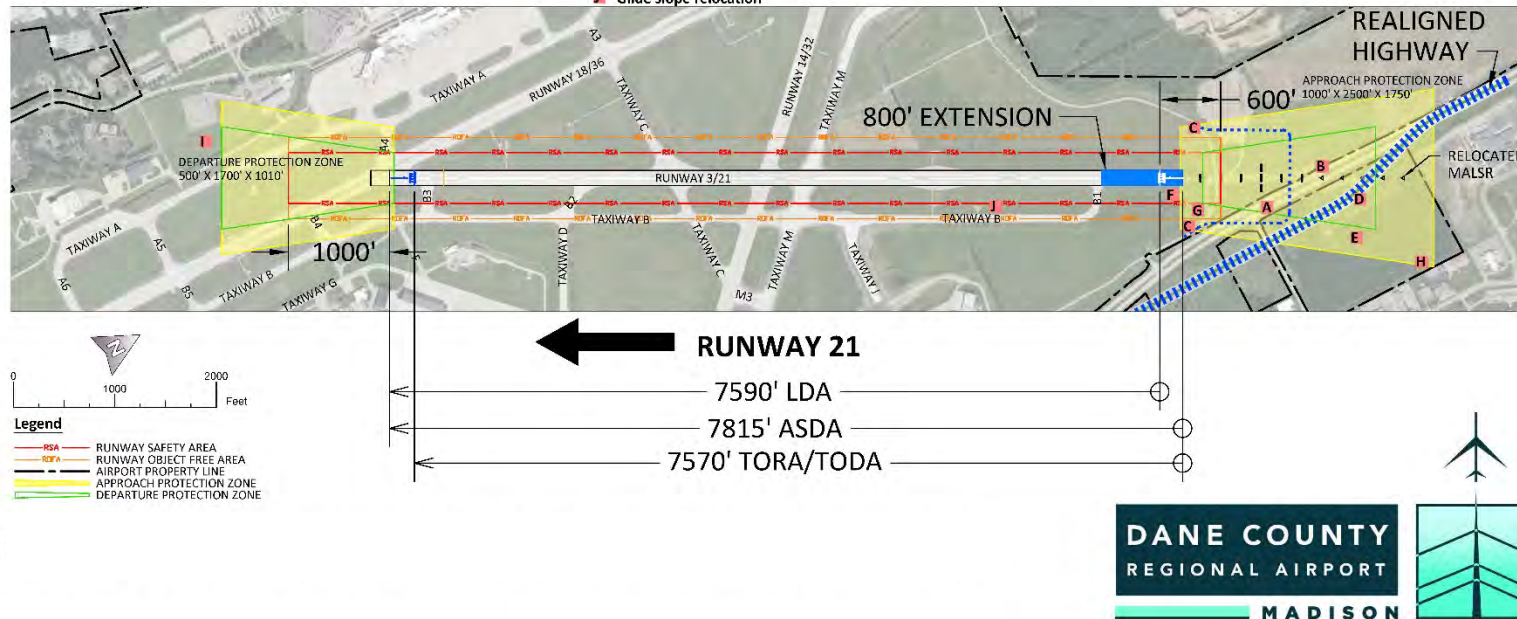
Alternative 4 – Extend Runway 21 North, Relocate Highway
